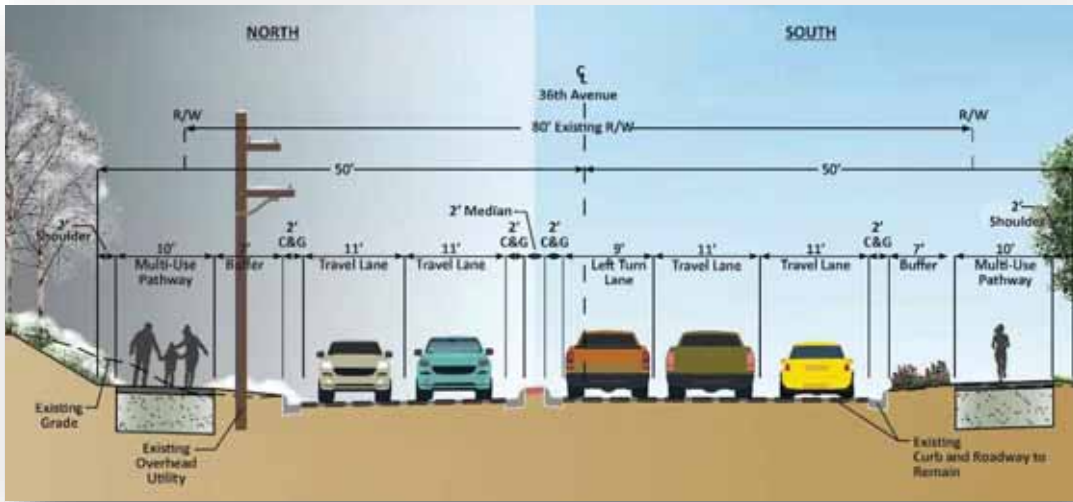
36th Avenue (A Street to Old Seward Highway) – Alternative 2
